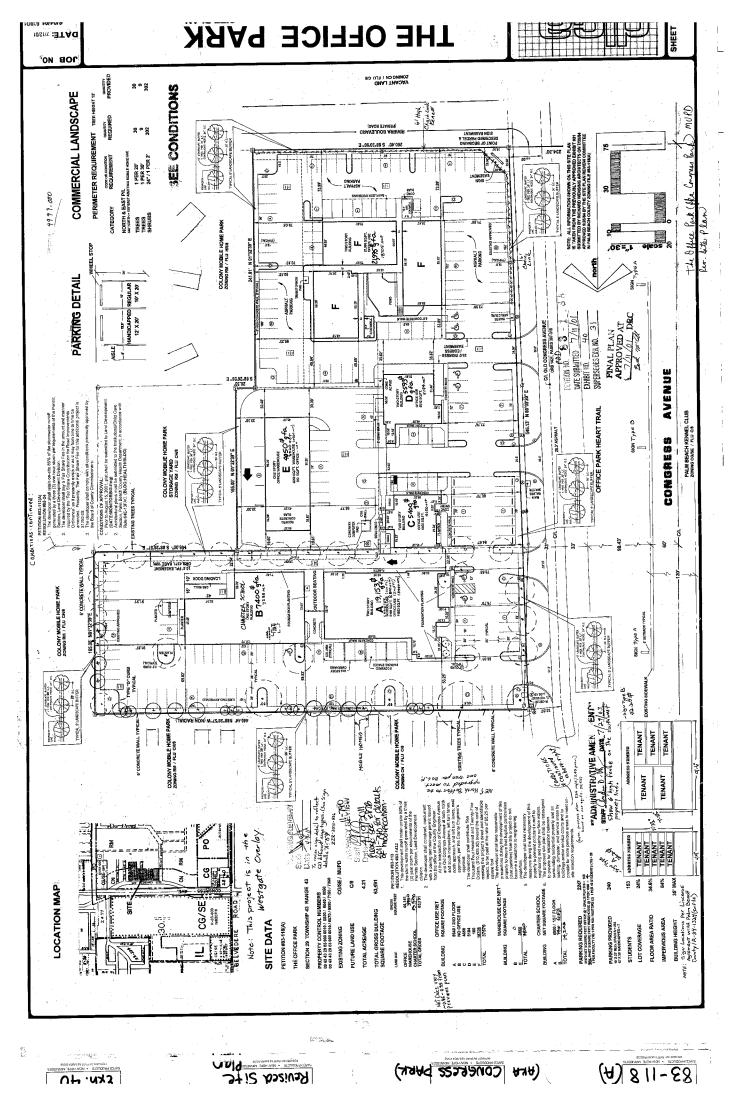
Previously Approved Final Site Plan Exhibit 40 dated July 11, 2001
